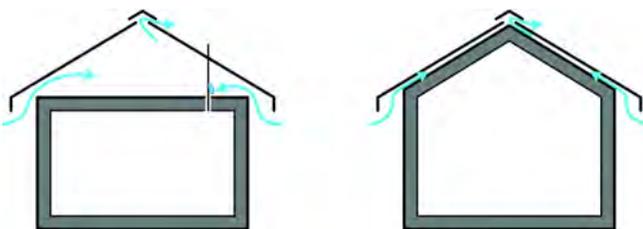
Ventilated attic (left) and ventilated cathedral ceiling (right) assemblies.
